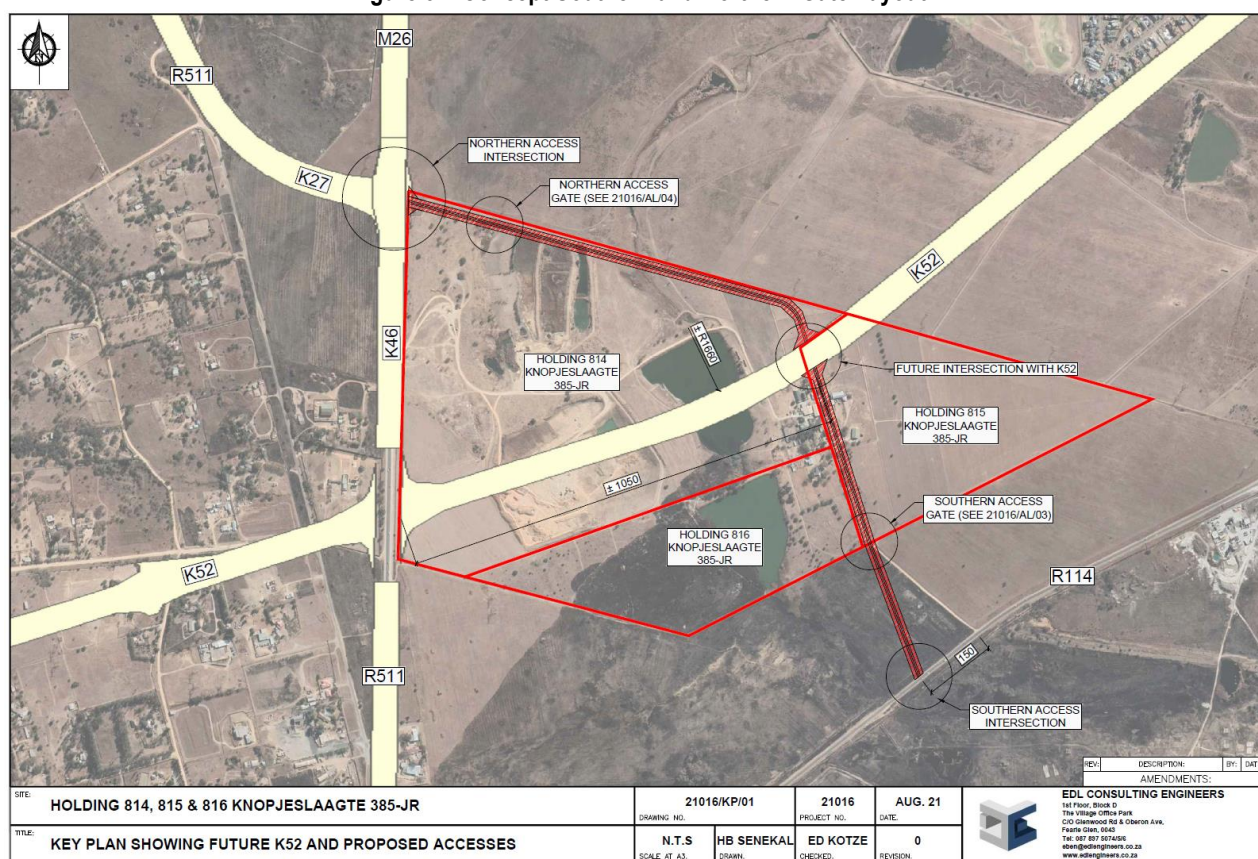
Key Plan Showing Future K52 and Proposed Accesses
